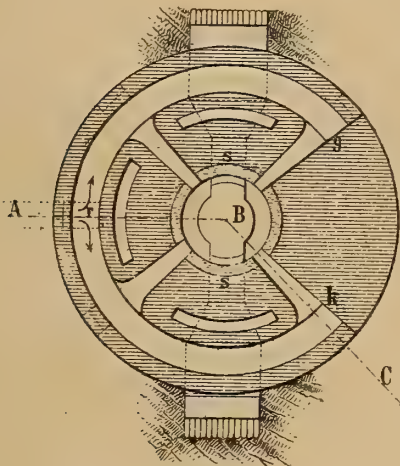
HORIZONTAL SECTION OF HODECK KILN
